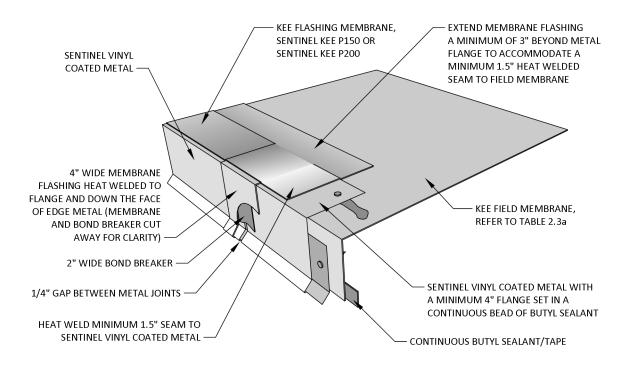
Induction Welded KEE Field Membrane at Drip Edge
